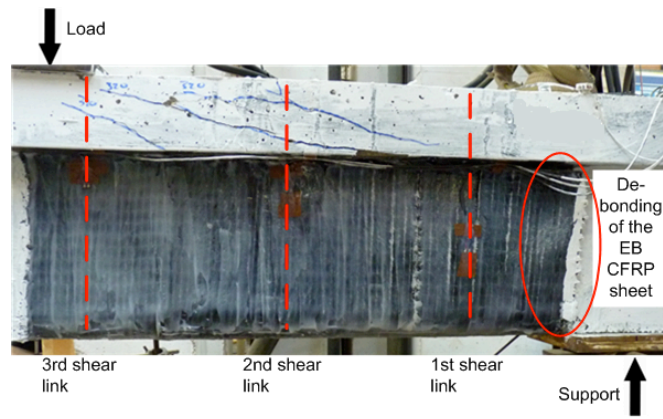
Typical failure mode of the beams strengthened with the EB CFRP sheets
